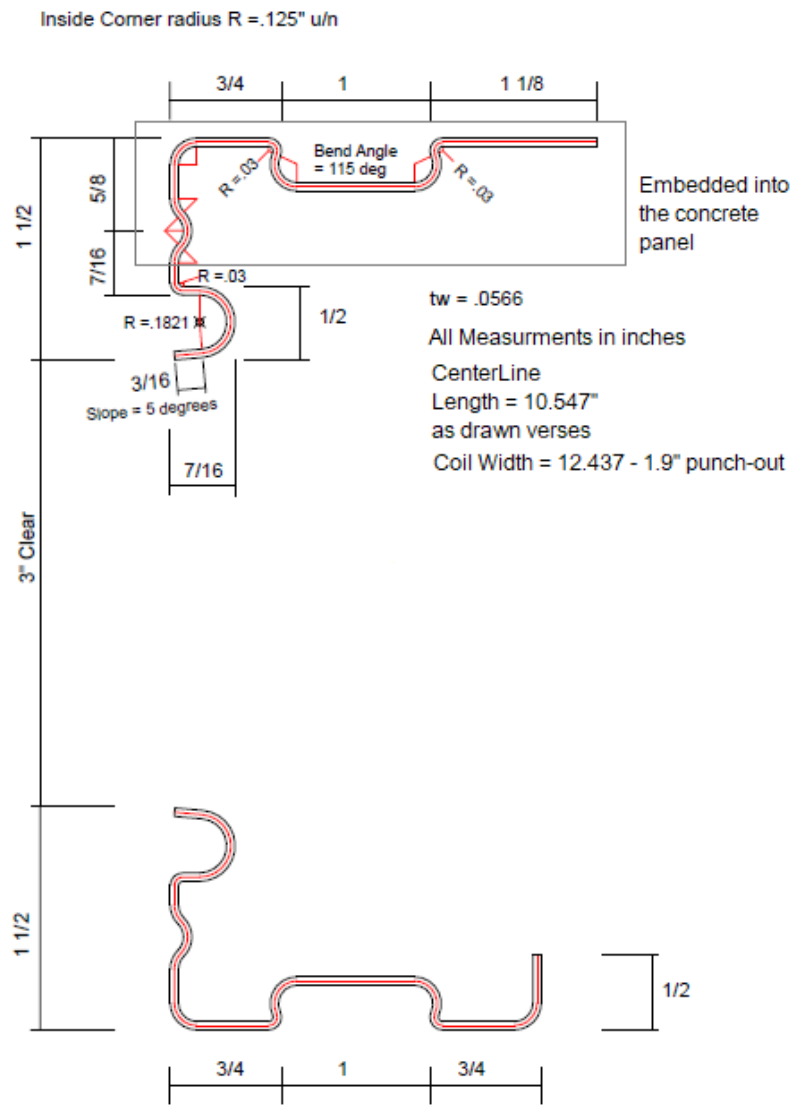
Weak cross-section of the exterior steel (Angle, 2015)
